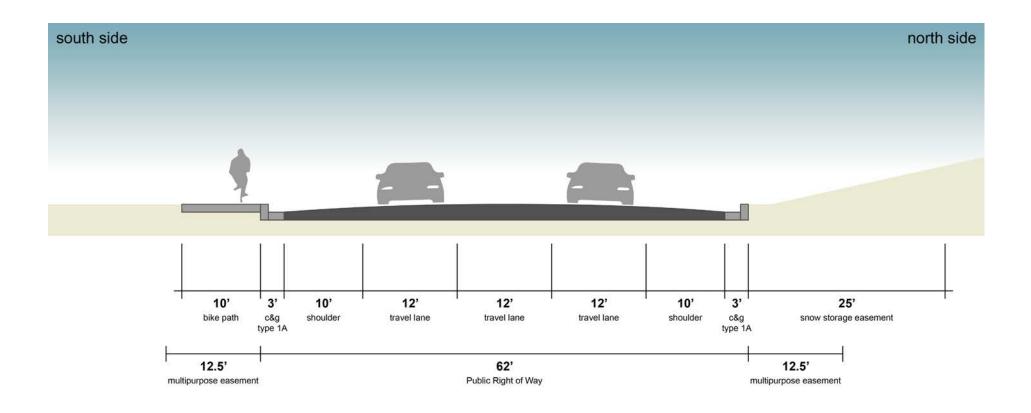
SECTION B: SQUAW VALLEY ROAD (NORTH)
